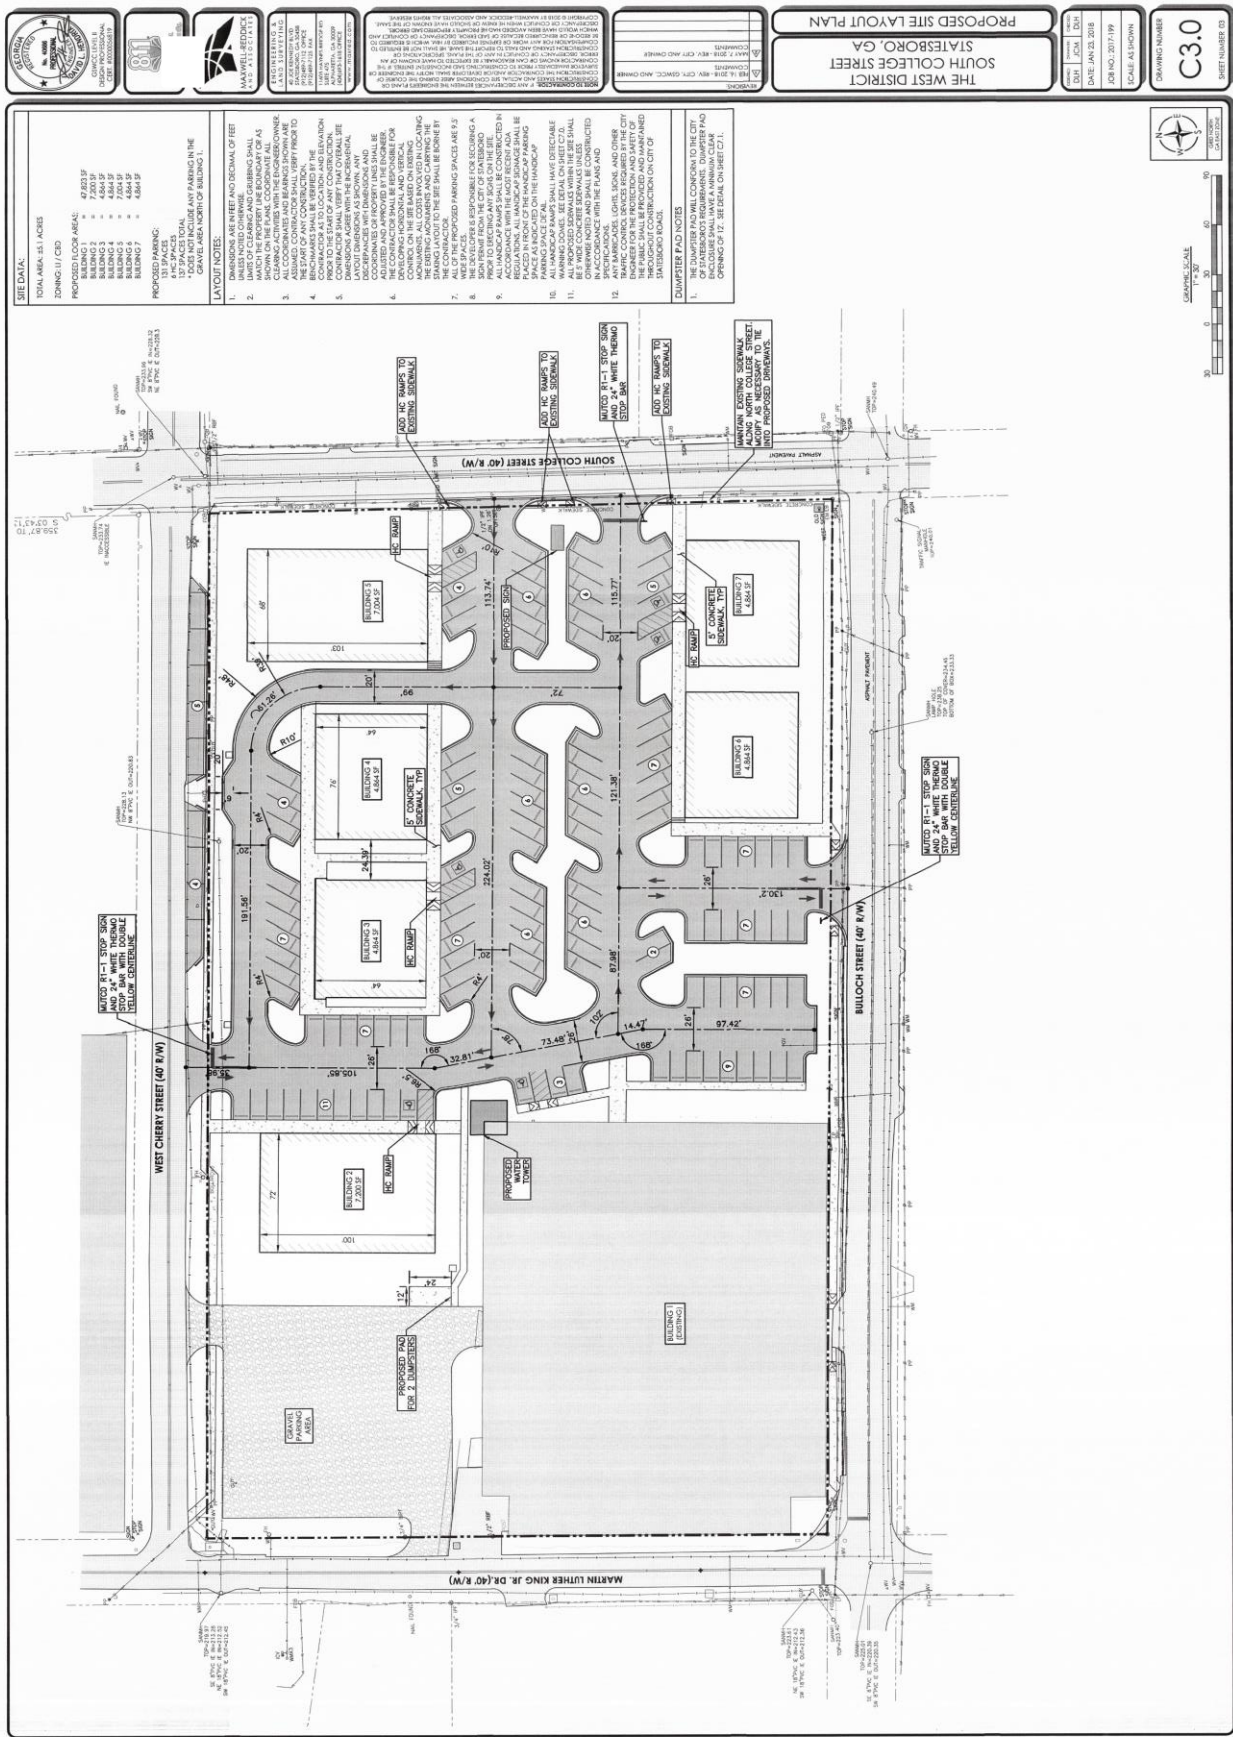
EXHIBIT G: PREVIOUSLY APPROVED SITE PLAN UNDER RZ 18-01-08 (Dated August 11, 2017)
